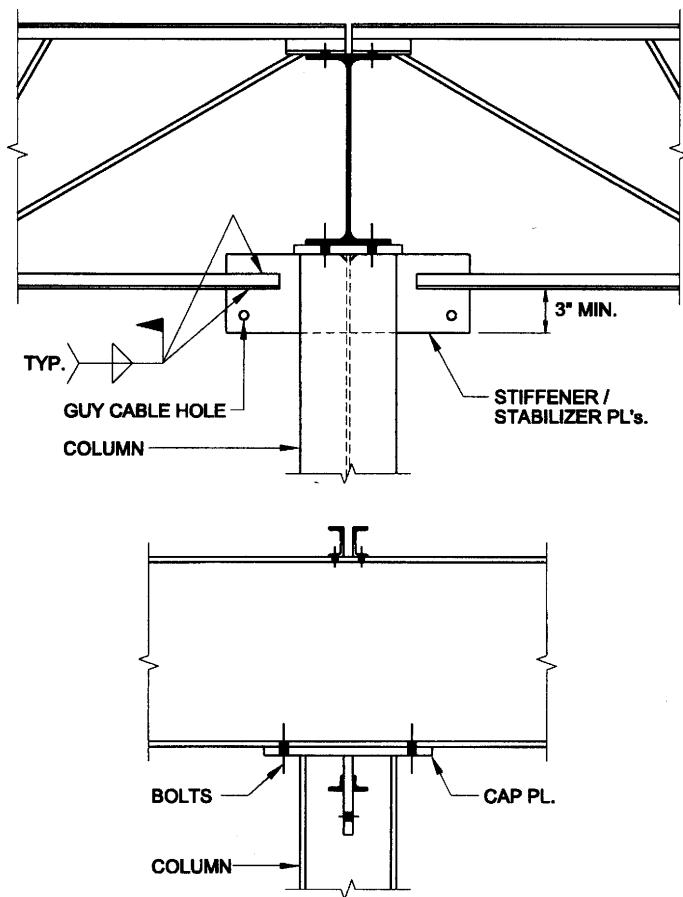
Beam framing continuously over column top, stability provided with welded joist-chord extensions at column top.
